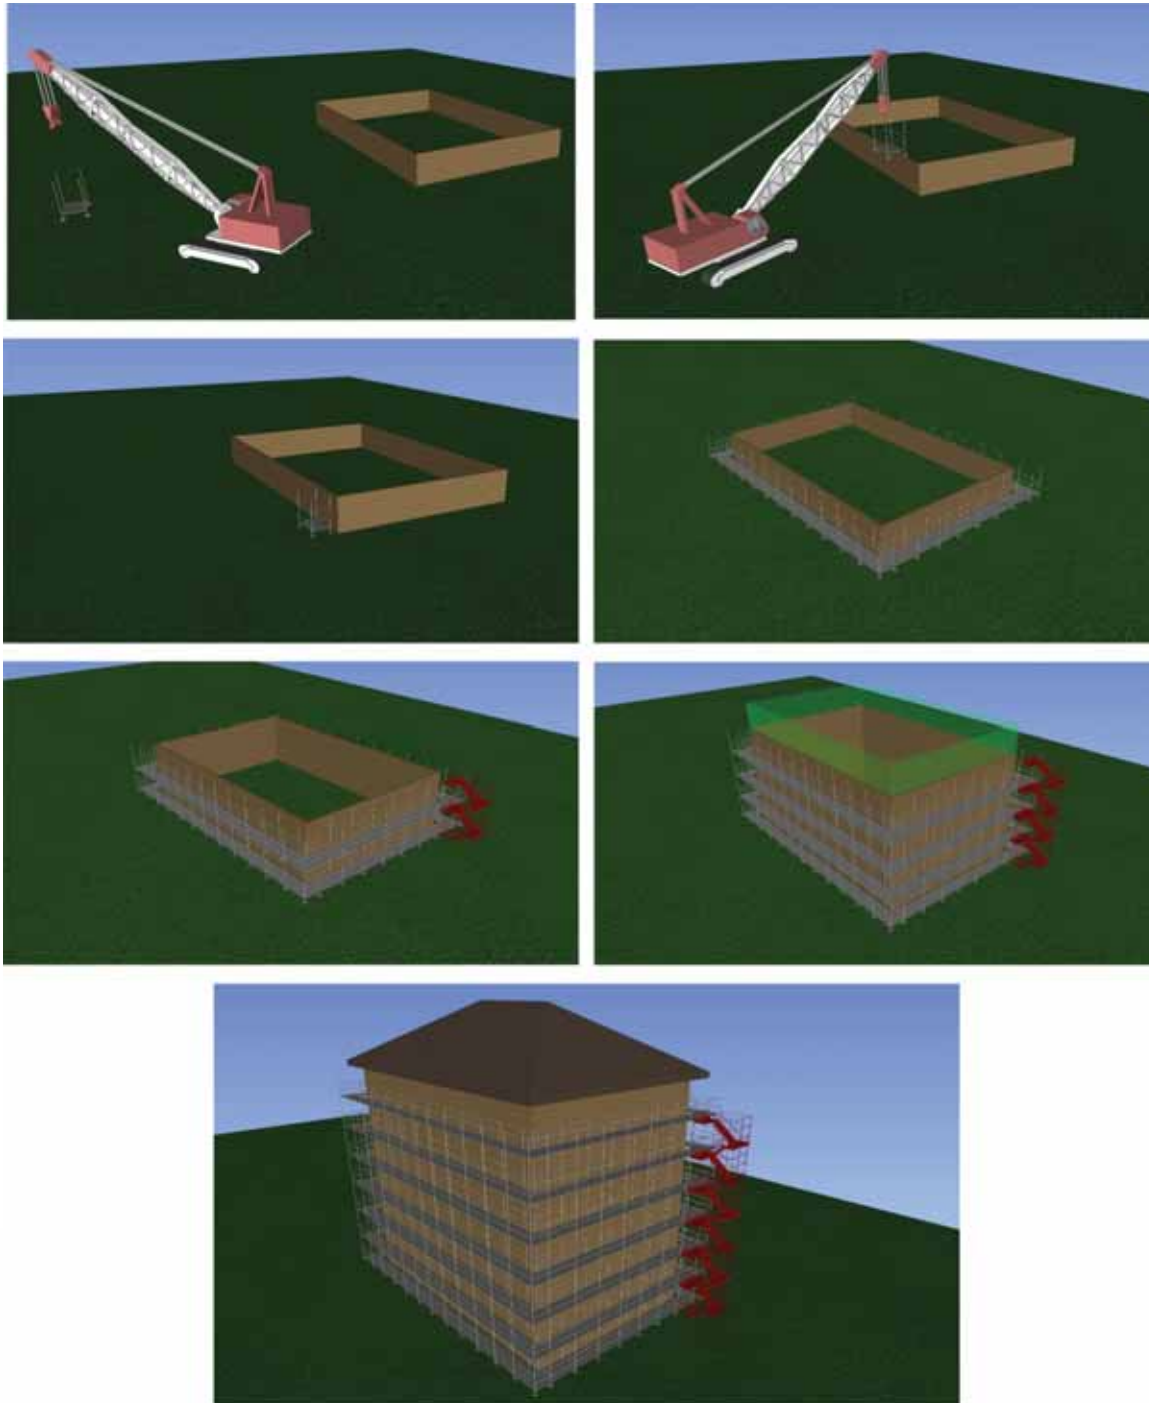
BIM for 4D scheduling of the scaffolding work
